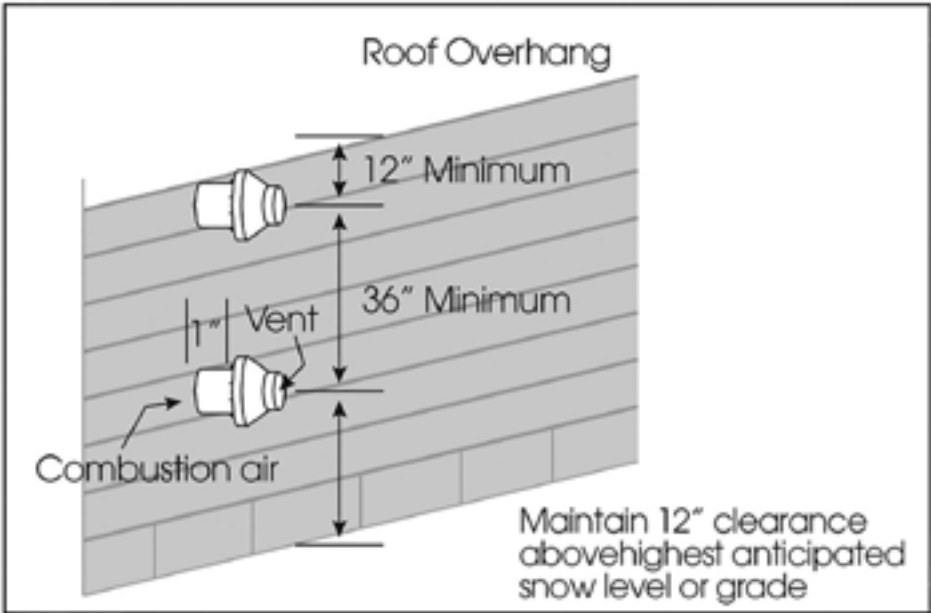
Sidewall Termination for Multiple Concentric Vents (Vertical)
